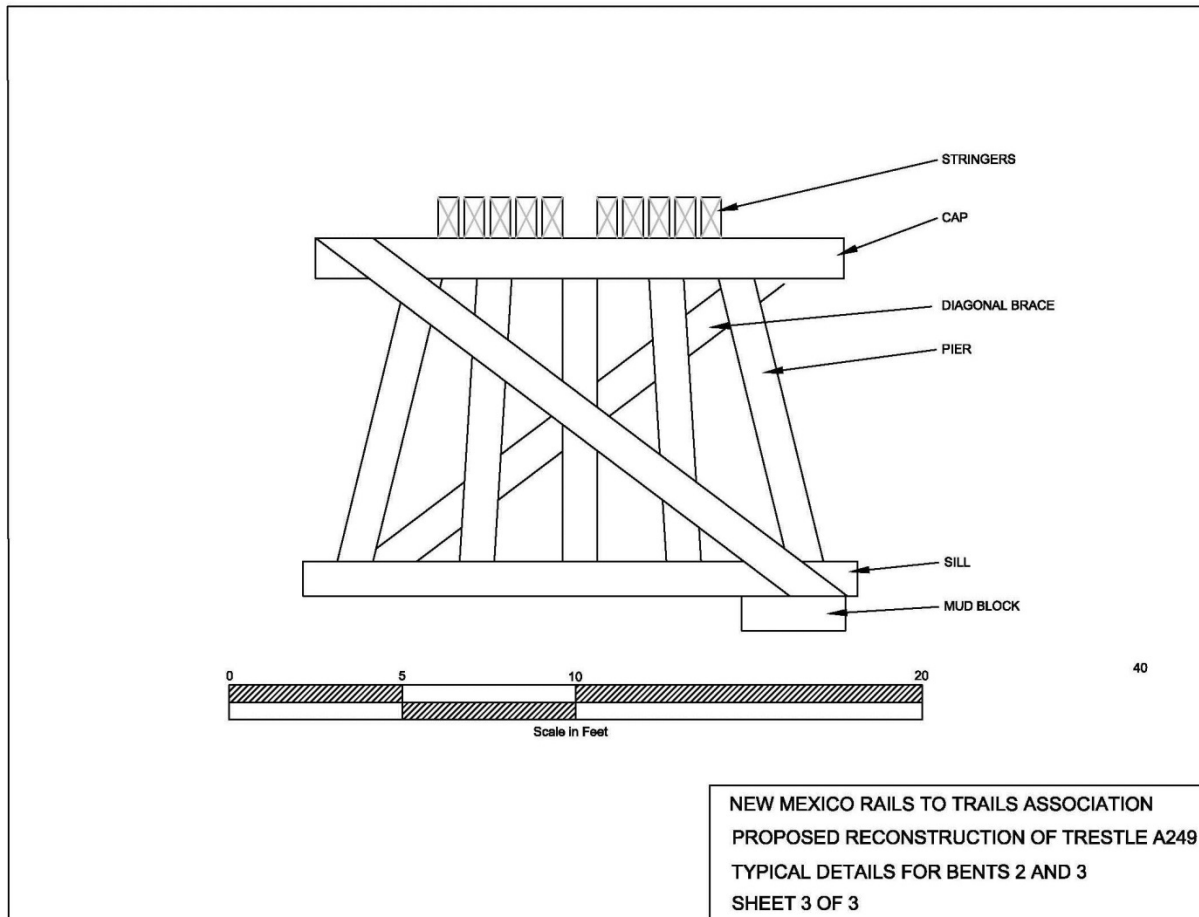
Proposed Reconstruction of Trestle A 249, Typical Details for Bents 2 and 3.
